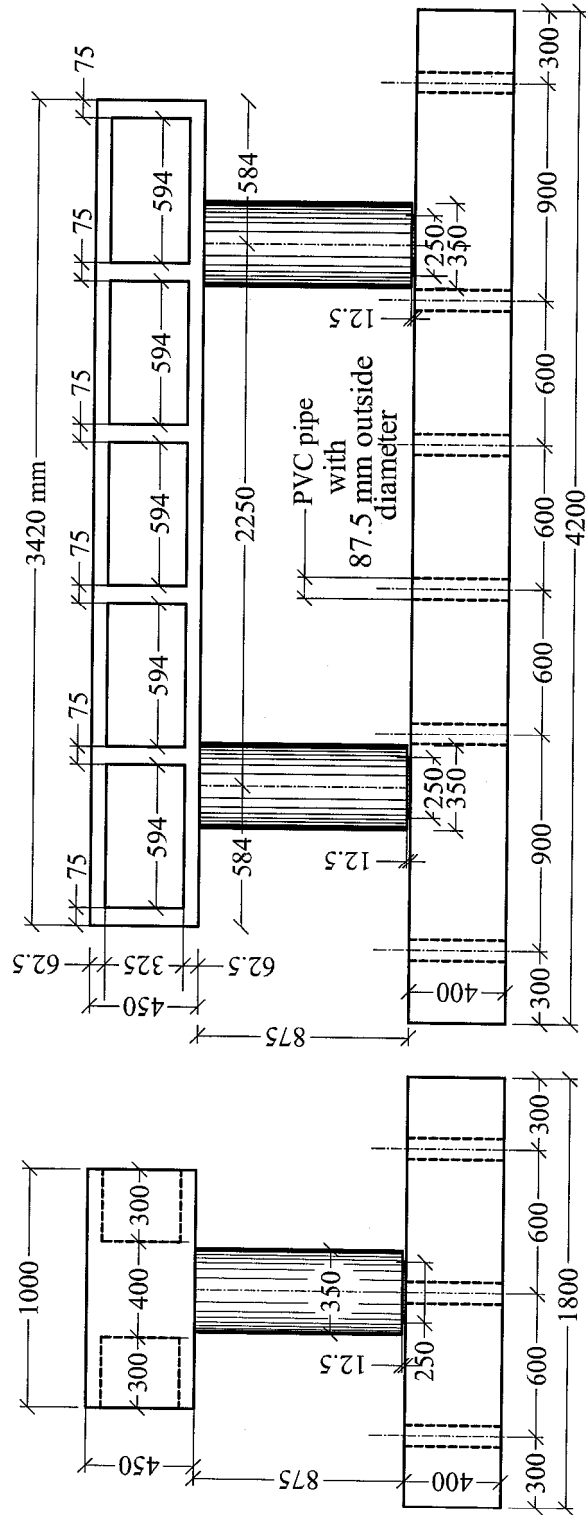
Concrete Dimensions of Specimen B2CM, (SI Units)
